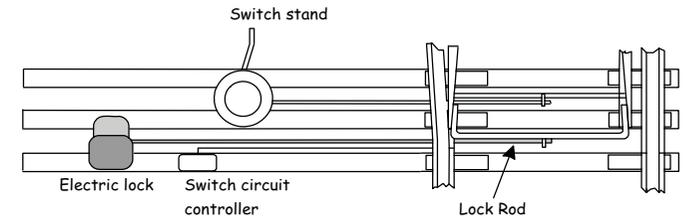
Layout with Switch Circuit Controller and Electric Lock
